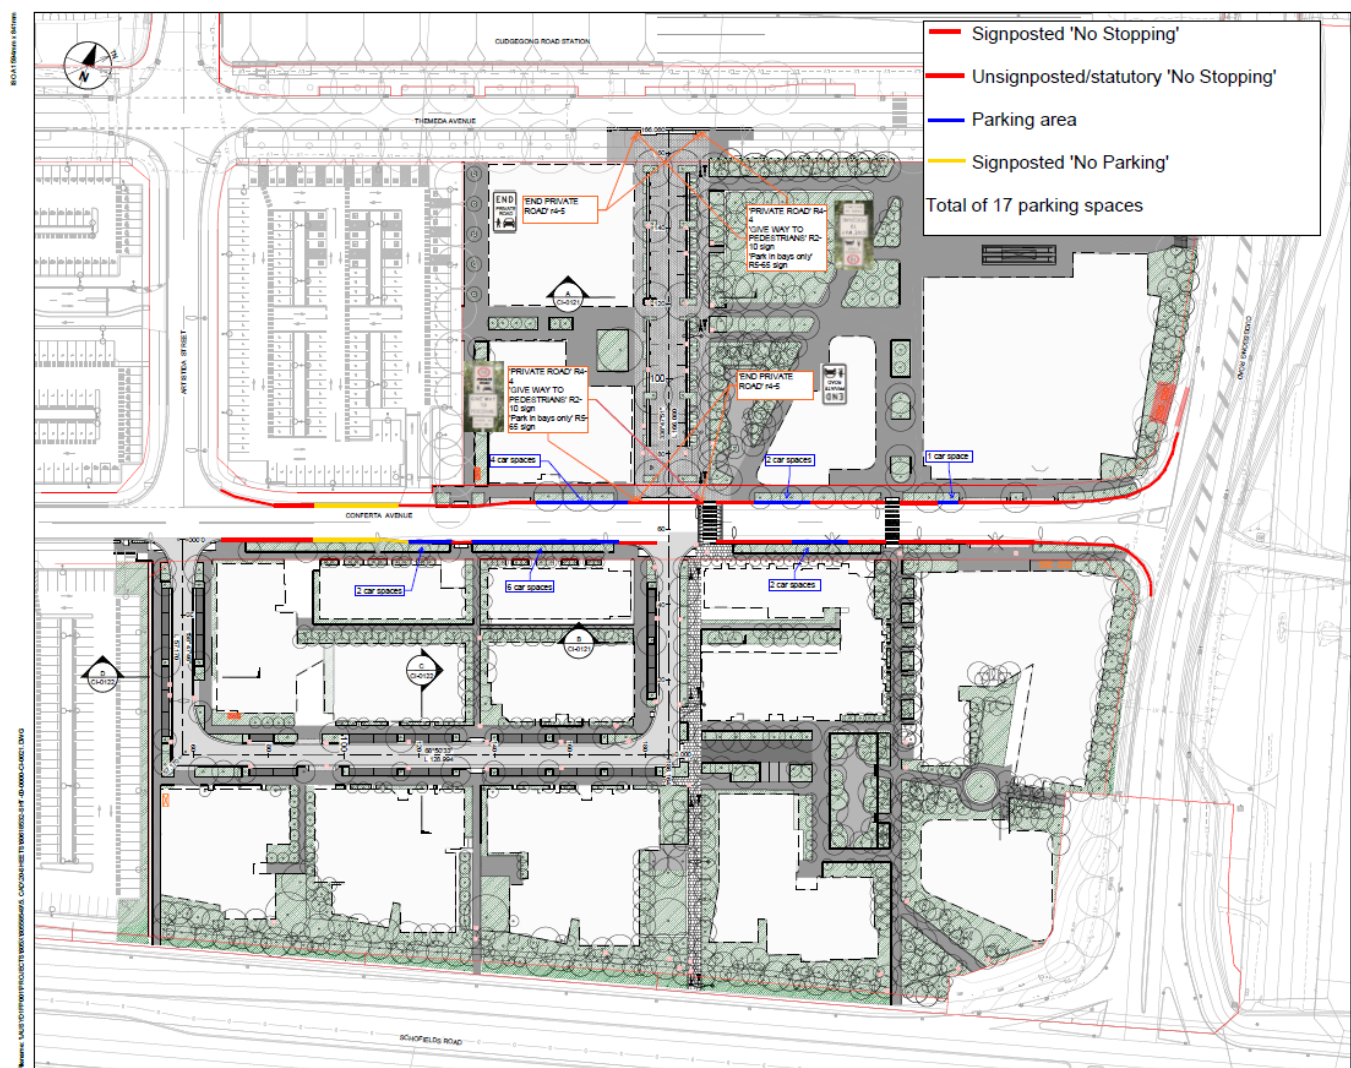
Extract from Civil Plans showing the proposed on-street parking in Conferta Avenue
